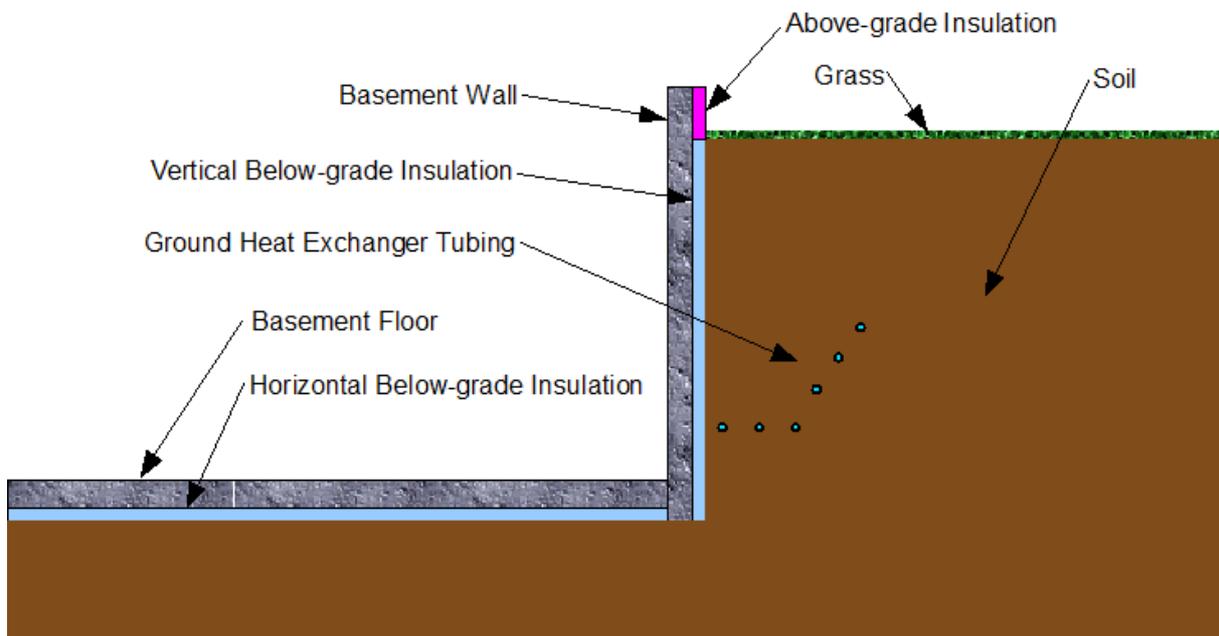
Cross-section of foundation, foundation insulation and foundation heat exchanger.
